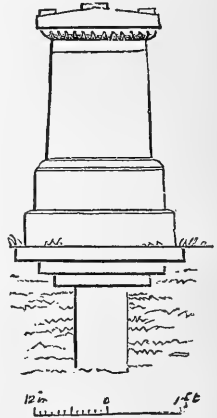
Pedestal resting on a 9-inch underground Pier.
